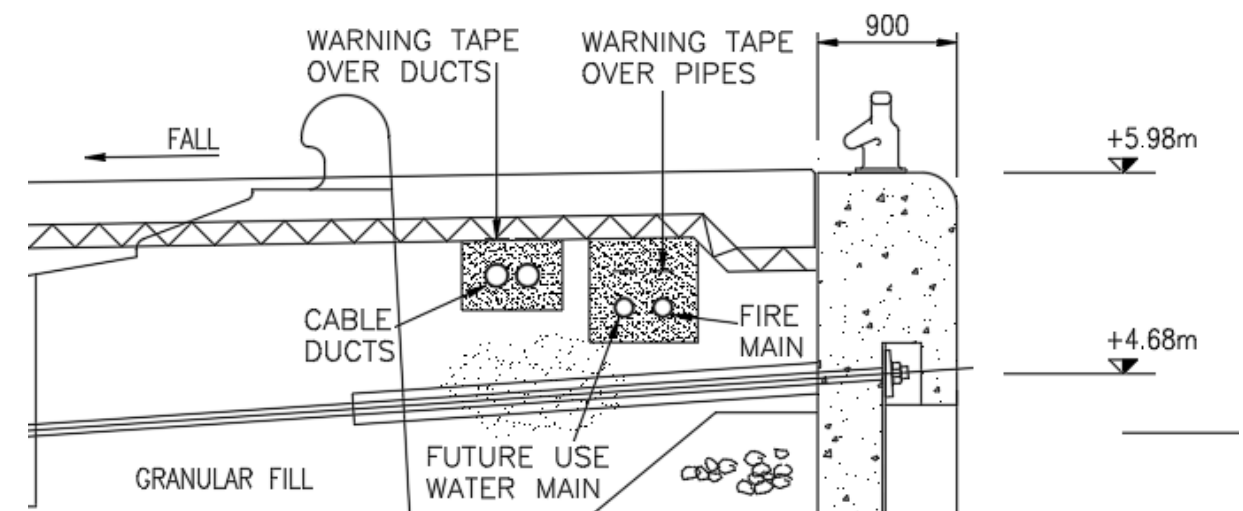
19 : Extract from Arch Henderson as-built drawing 03012-29 showing two water mains and cable ducts adjacent to the cope beam.
